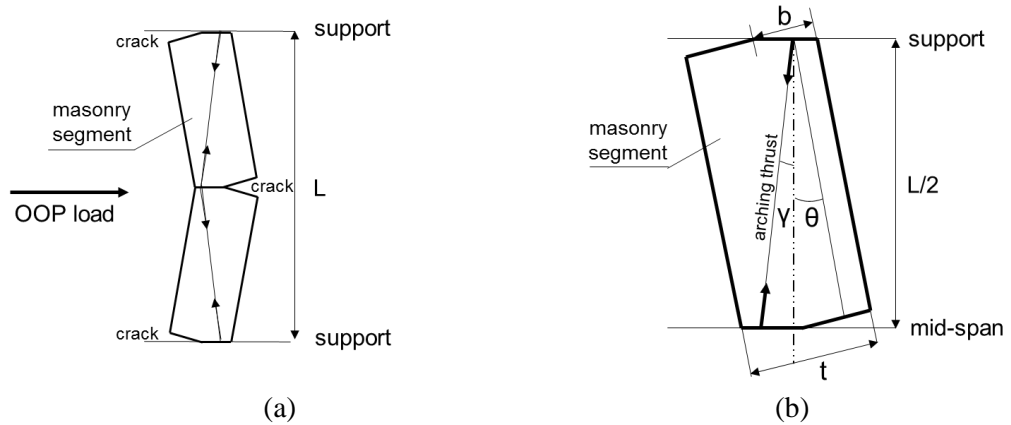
Cracked masonry stripe deformed shape at arching action occurrence (a) and masonry segment detail (b).
